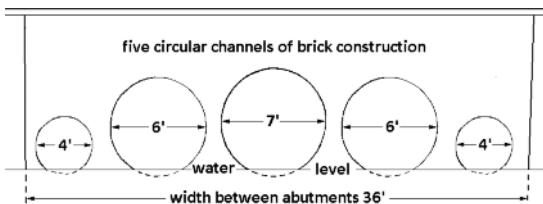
Holman's Bridge, measured sketch elevation by the author, showing the five circular channels.
